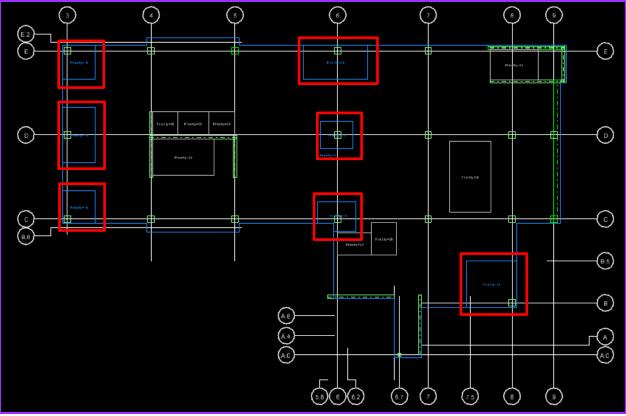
Flat Slab with Drop Panels – RAM Concept Plan
